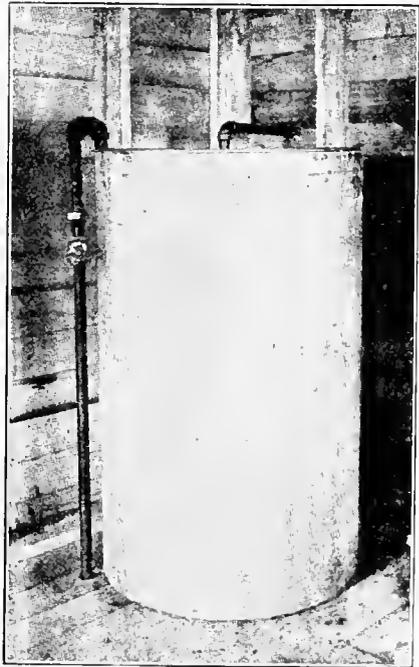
Tank used with steam heat. There is a steam coil in the bottom of the tank like the one shown on front page.
